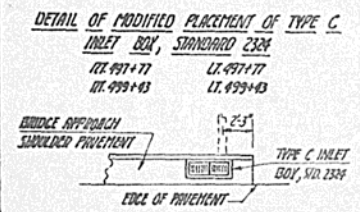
PLAN-PROFILE D.P.R. STANDARD
